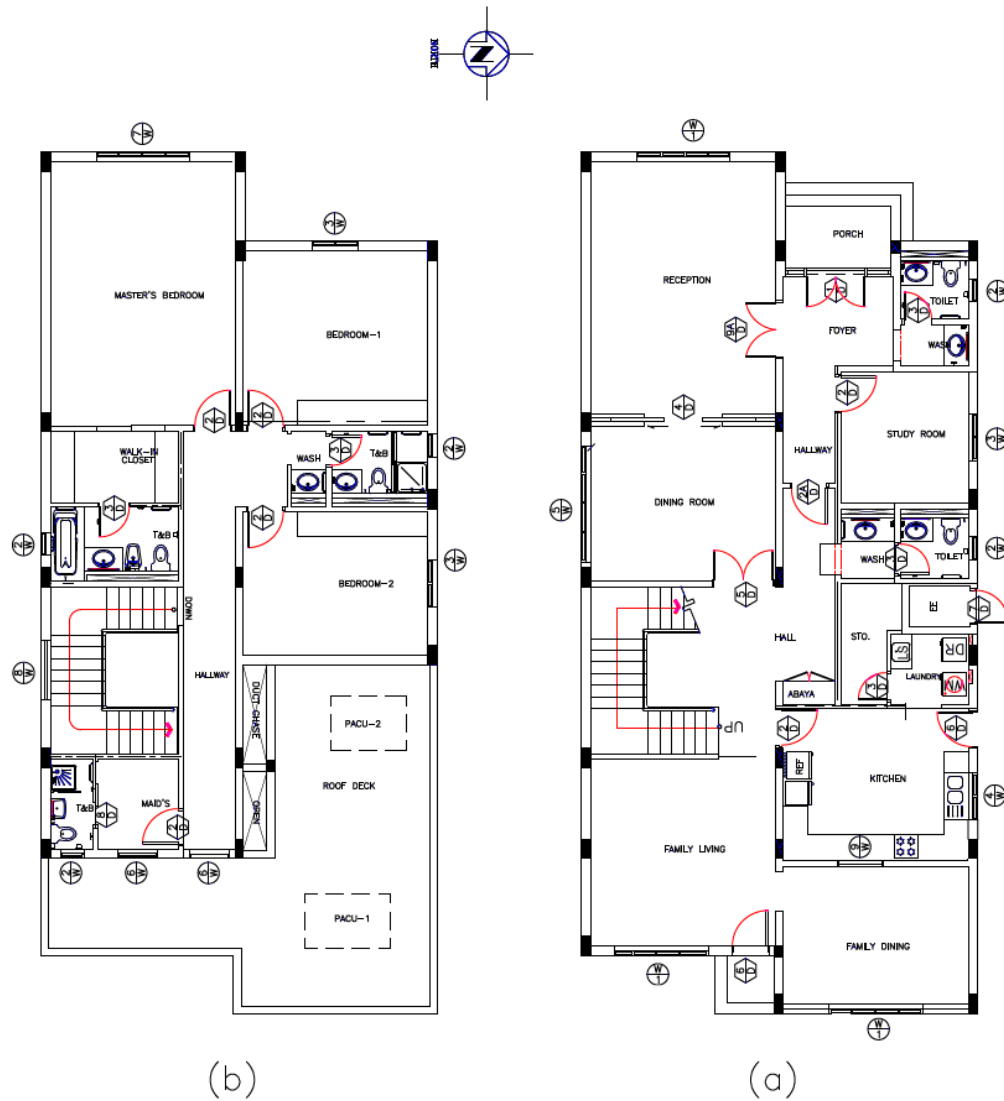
(a) Ground floor plan, (b) First floor plan
